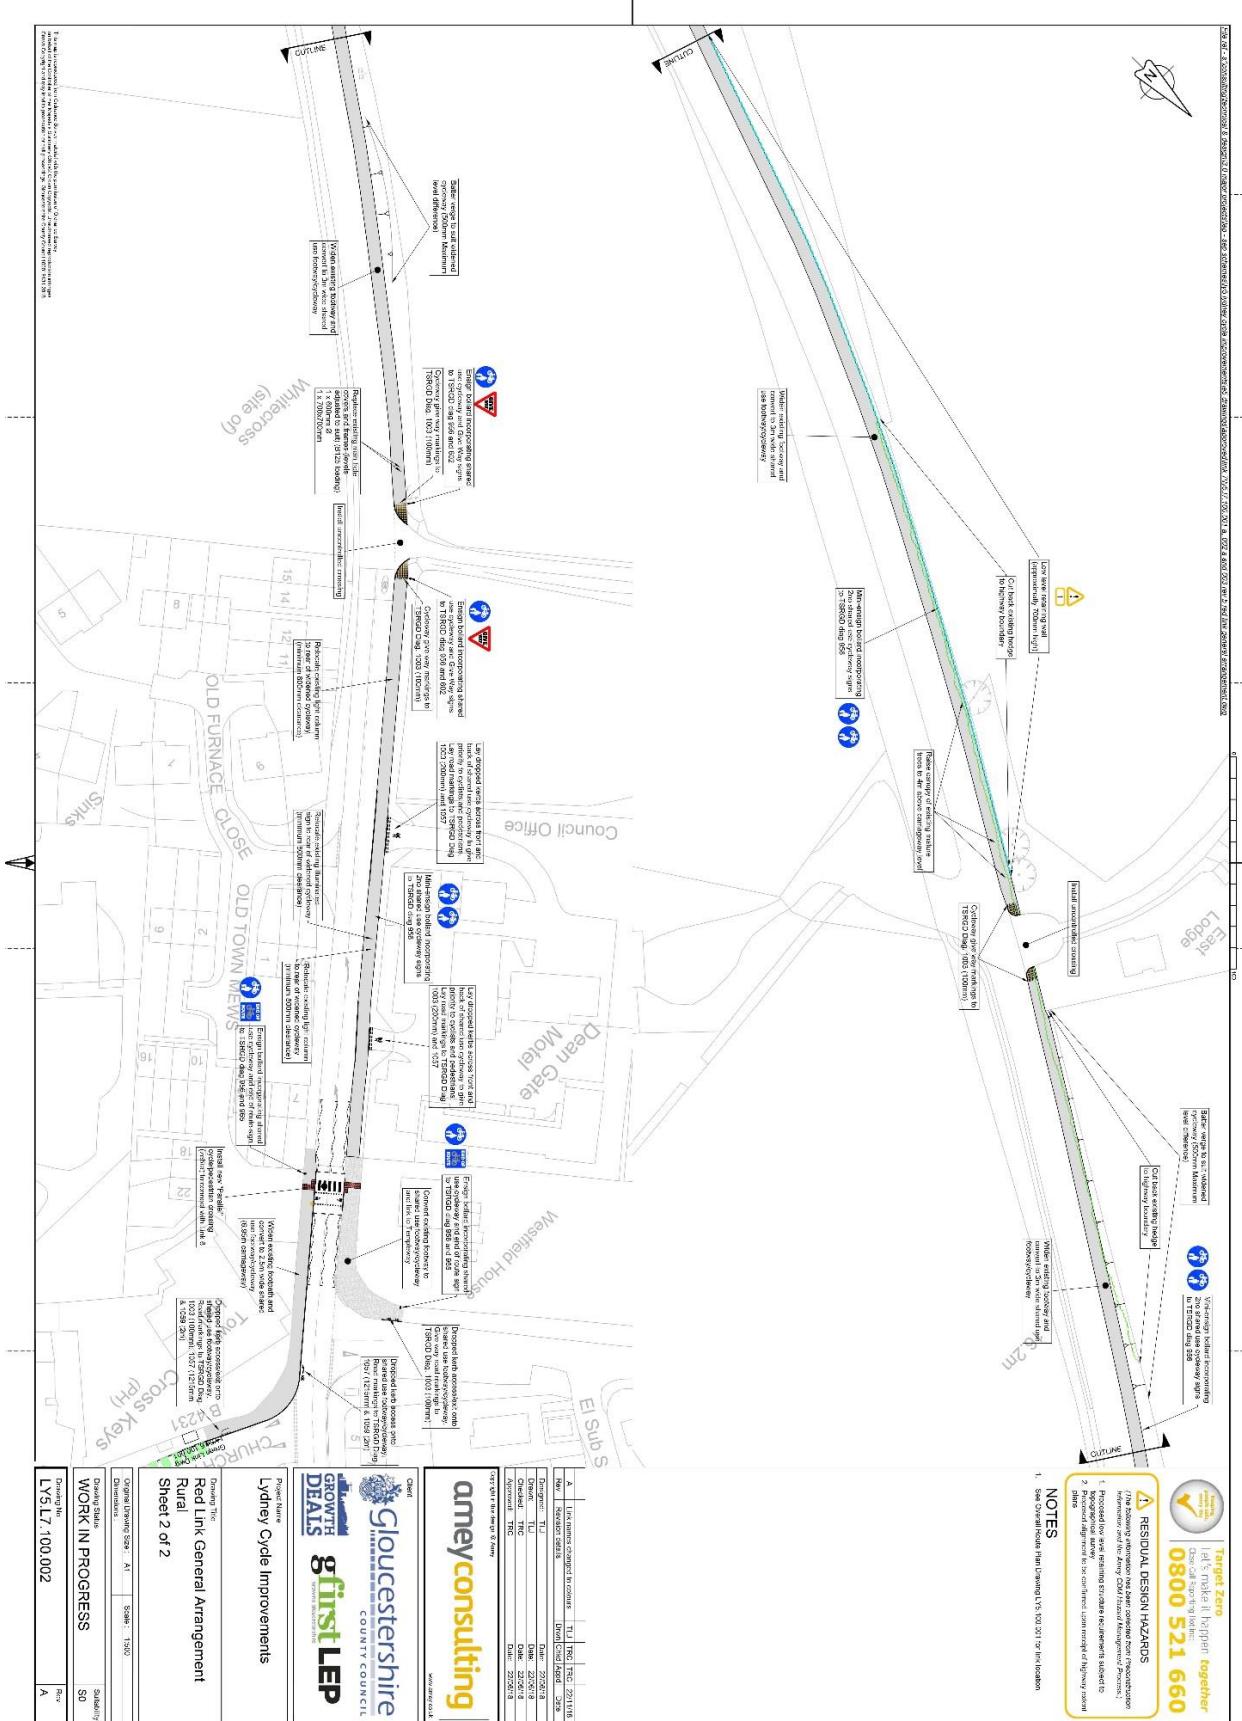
Red Link General Arrangement Drawing - Rural Sheet 2 of 2
